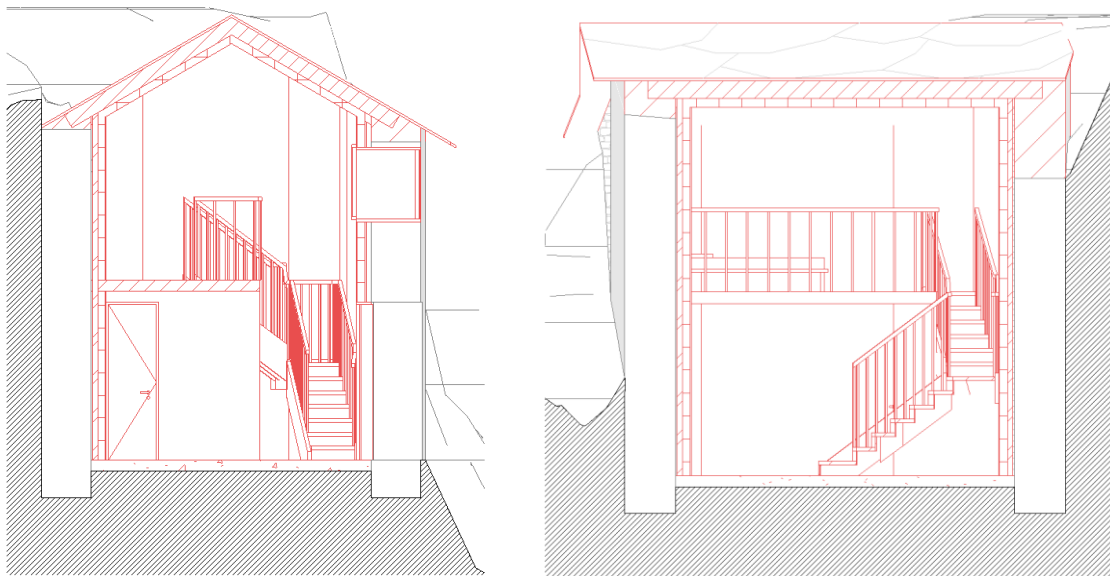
Transversal and longitudinal sections of the construction and demolition works, respectively (author's figure)
